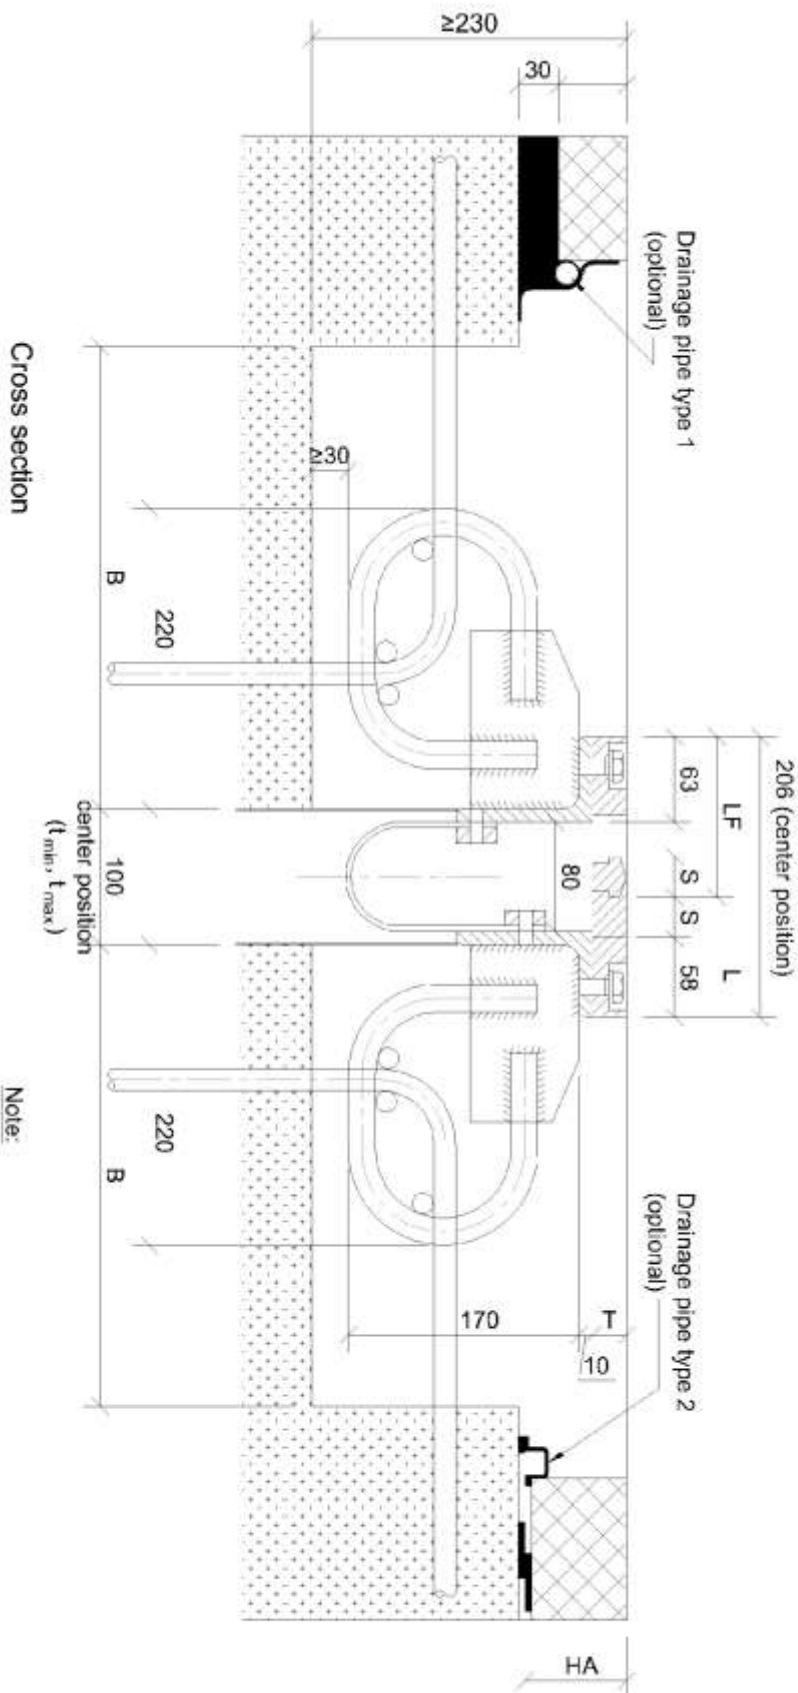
Typical dimensions and cross section for Tensa Finger expansion joints ranging from RSFD-B 60 to RSFD-B 140
